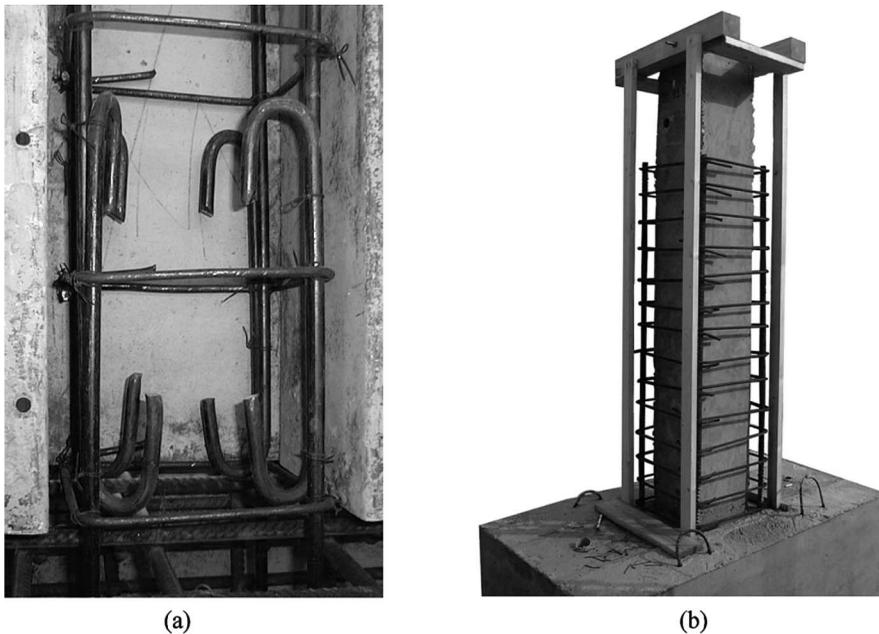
Laps at column base in specimen Q-0L2. (a) jacket reinforcement embedded in column base (b).
